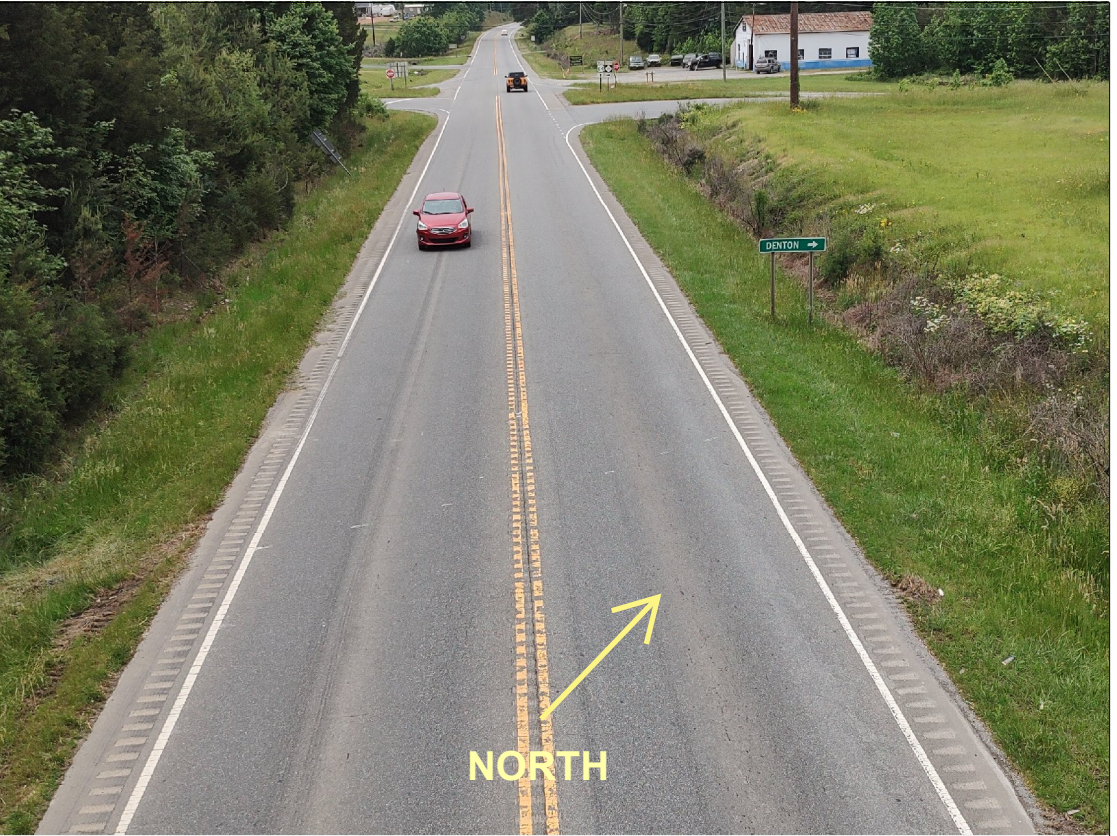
VIEW LOOKING NORTHWEST ALONG US 64 FROM EXISTING BRIDGE DECK.
